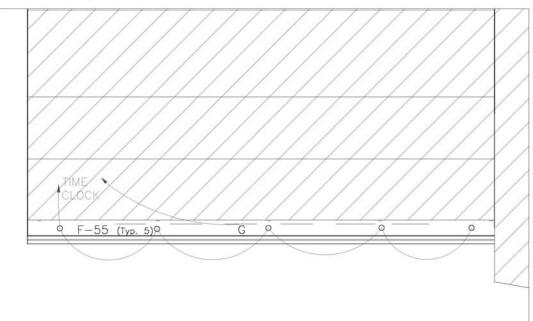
Façade Luminaire Layout – Version 1 Plan
